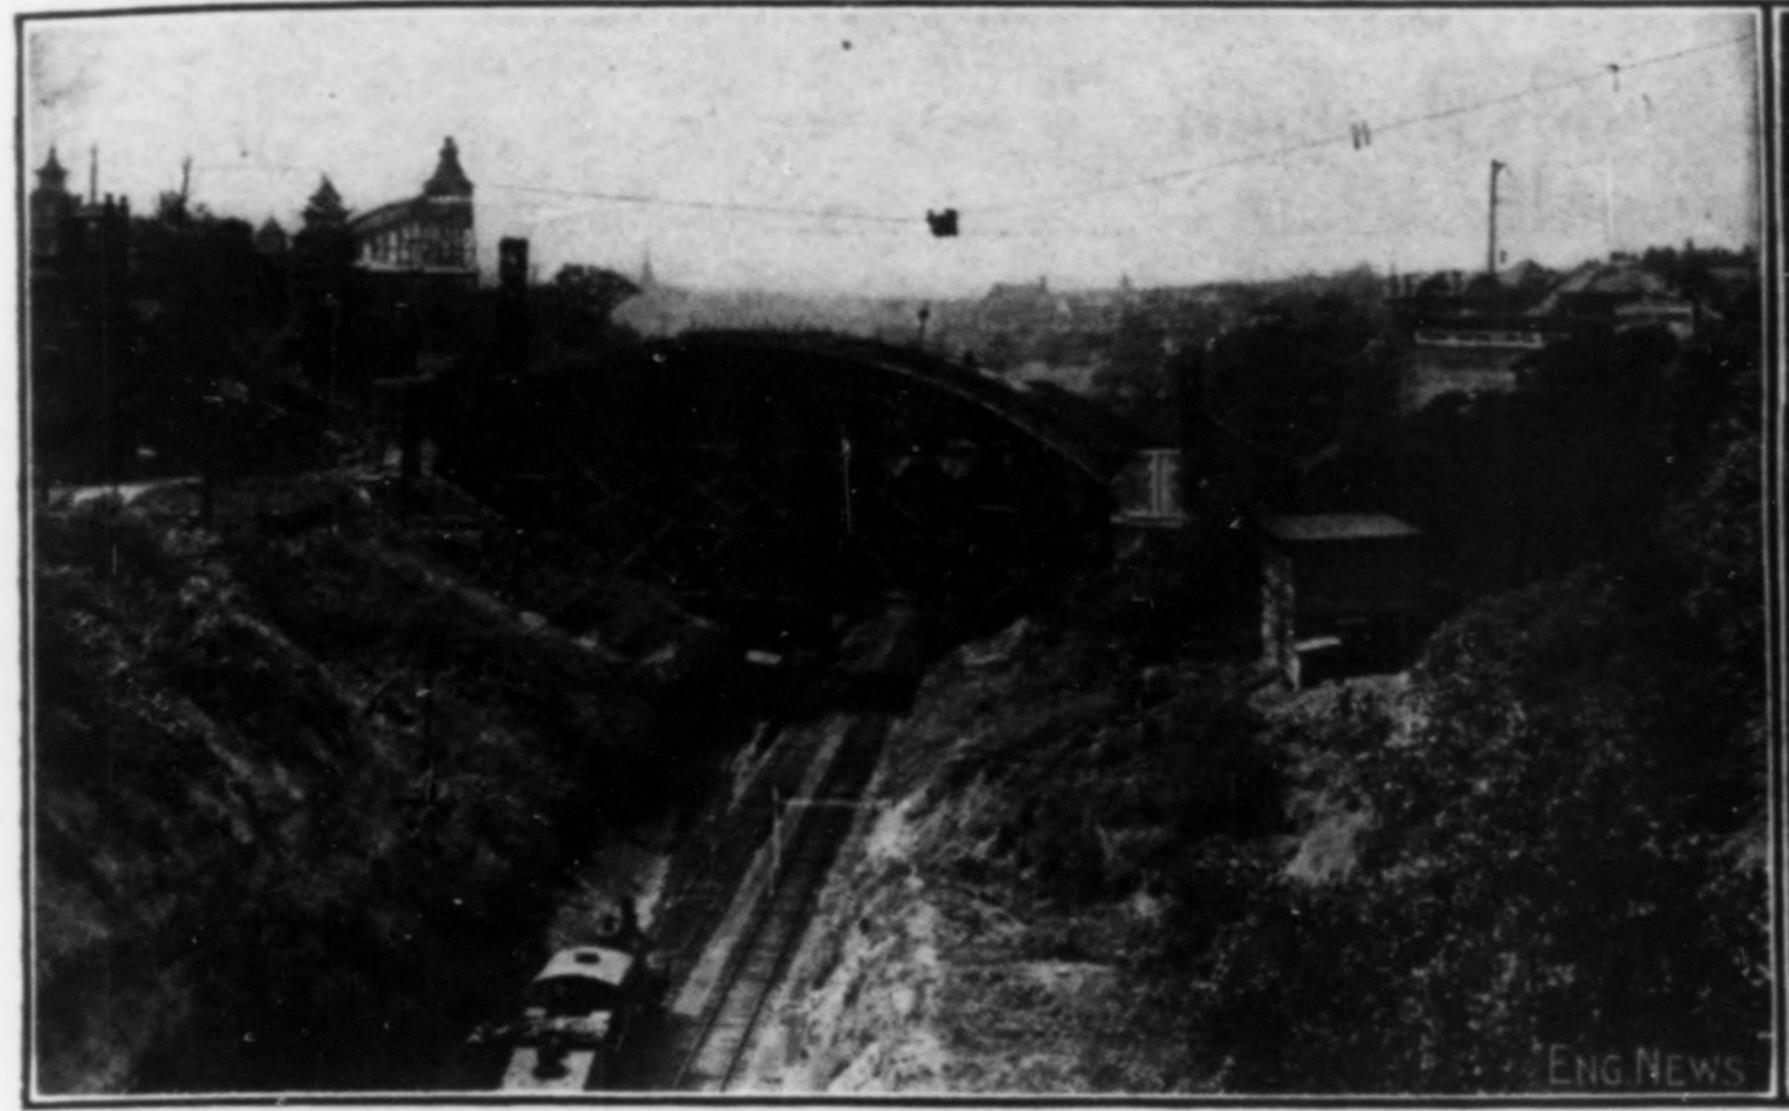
CENTERING FOR ATHERTON AVE. BRIDGE OVER PITTS-BURGH JUNCTION R.R., SEEN LOOKING NORTH
